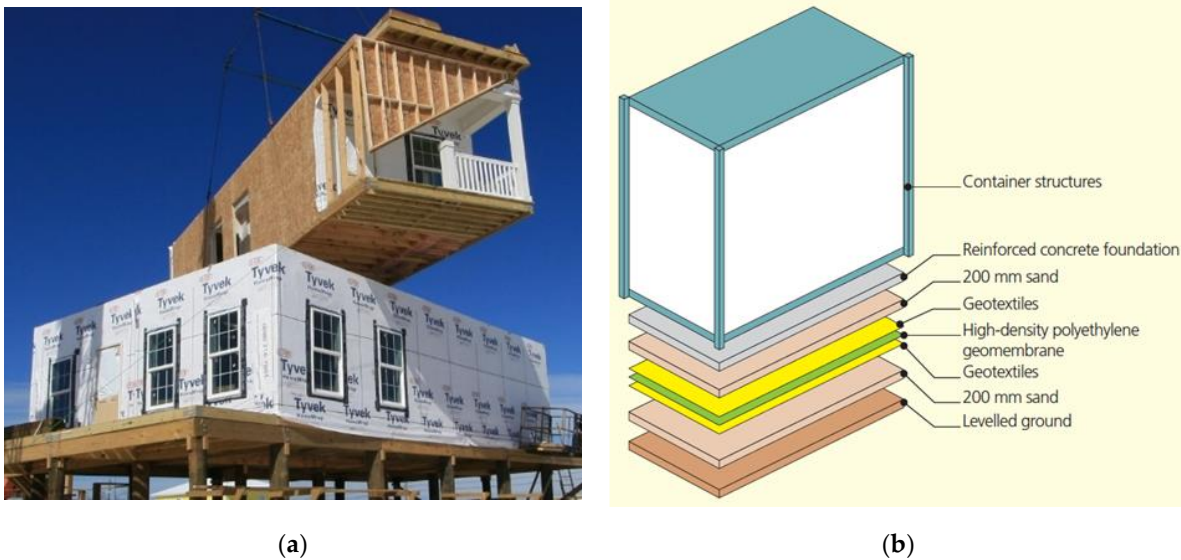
(a) modular timber residential building (Modular Home Builders Association, 2021) and (b) A typical structural build-up (Zhou et al., 2021)
